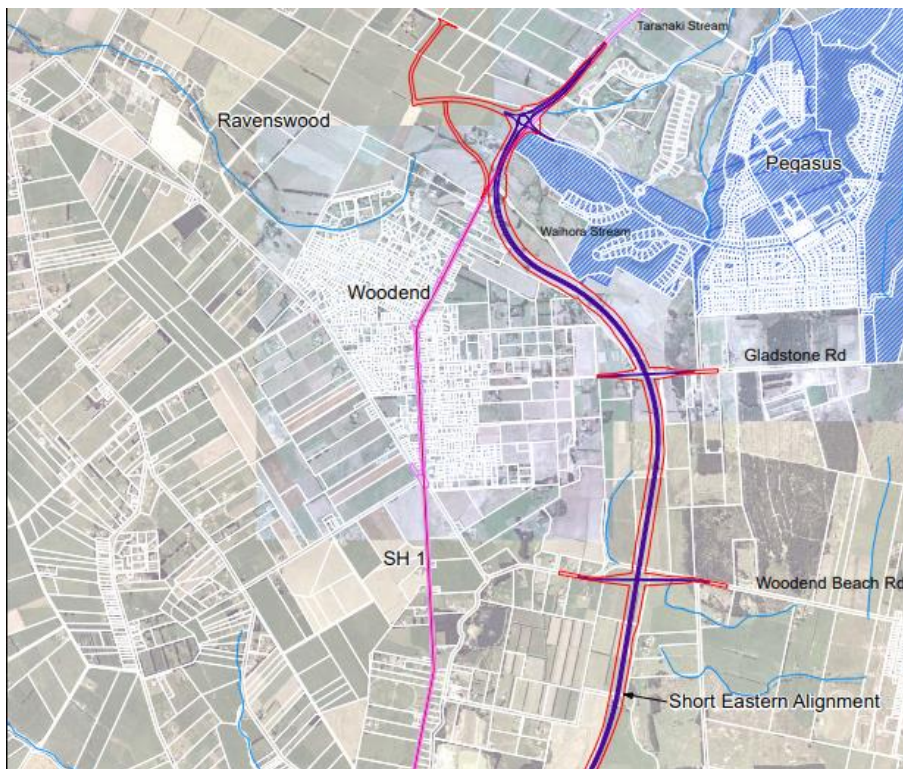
Woodend Bypass – Short Eastern Alignment
